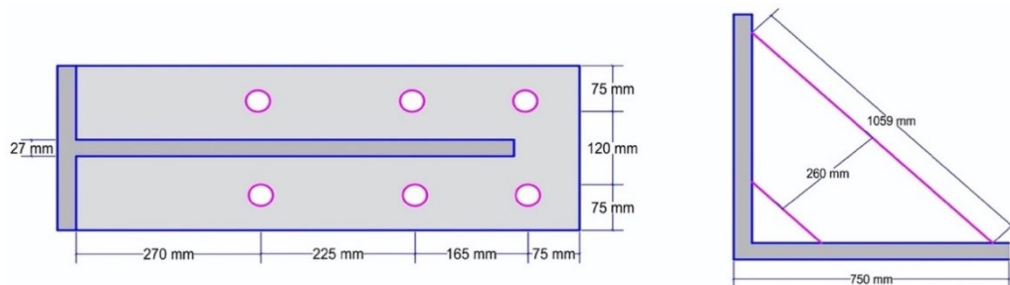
Schematic illustration of preliminary designed steel haunches: plan view (left) and side elevation (right) for the prototype frame.
